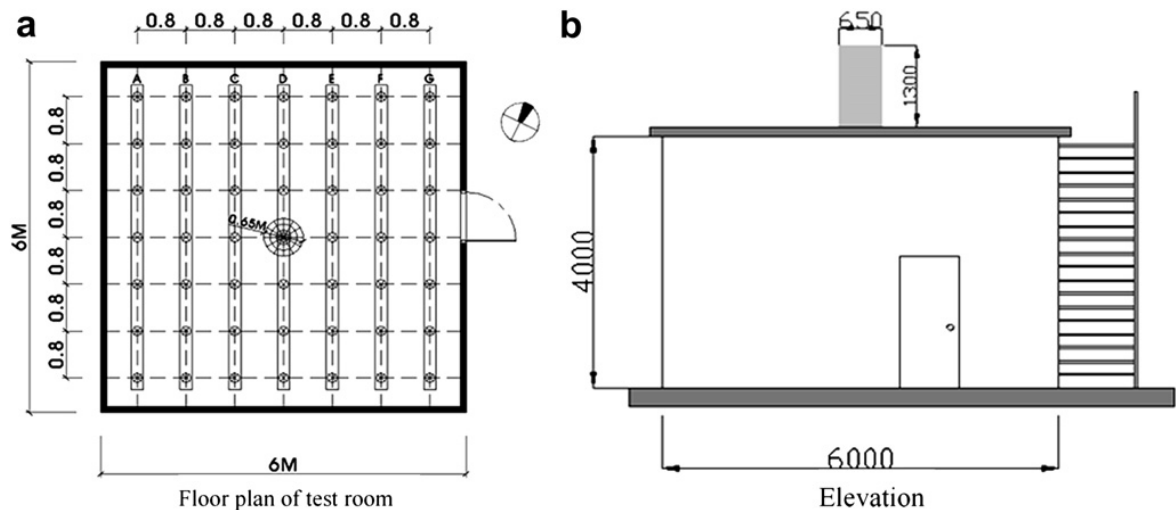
Mock up model configuration. (a) floor plan of test room, (b) Elevation (Source Kim J.T., Kim, G. 2009)
